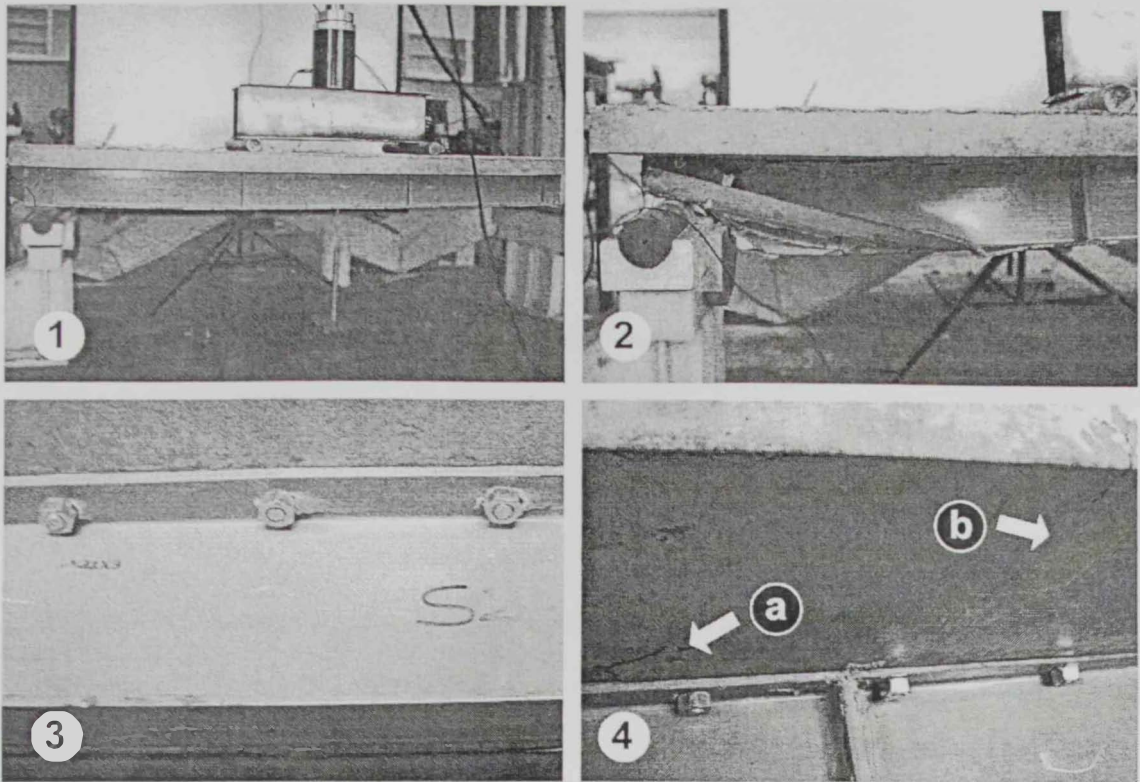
GFRP testing images 1. Test set up with 4 point loading, 2. Web buckling failure of GFRP beam over one support, 3. Deformation of GFRP at shear connectors at beam ends , 4. Cracks in the underside of the slab: a) curved crack around shear connectors on support side b) transverse cracks.
